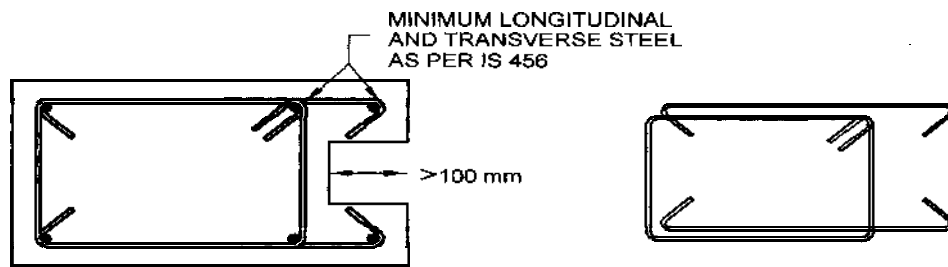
REINFORCEMENT REQUIREMENT IN COLUMNS WITH PROJECTION MORE THAN 100 MM BEYOND CORE
